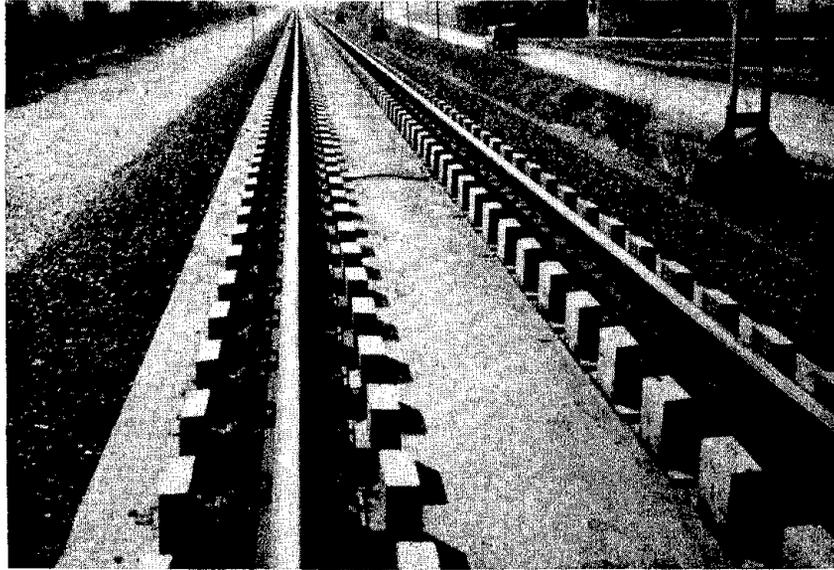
CONCRETE BLOCKS EMBEDDED IN SLAB
